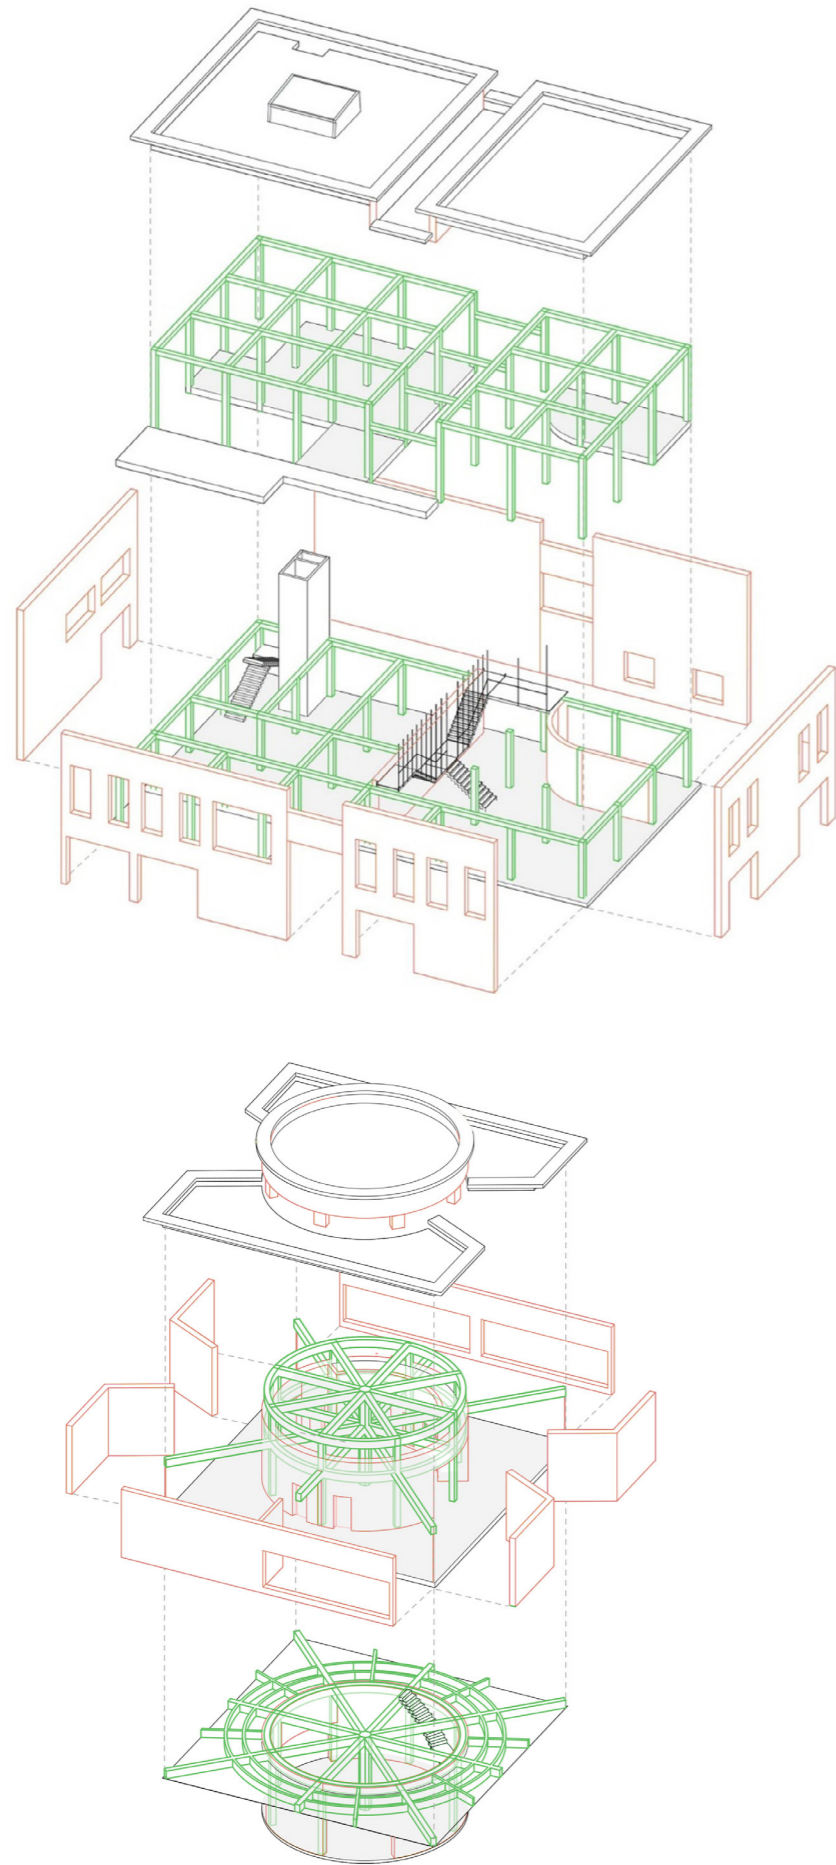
, 39, 40: Structural diagrams showing glulam beams and columns, in-situ hempcrete walls and prefabricated hempcrete panels. Sequence: Log in Space, Unplug Space, Docking Station.
